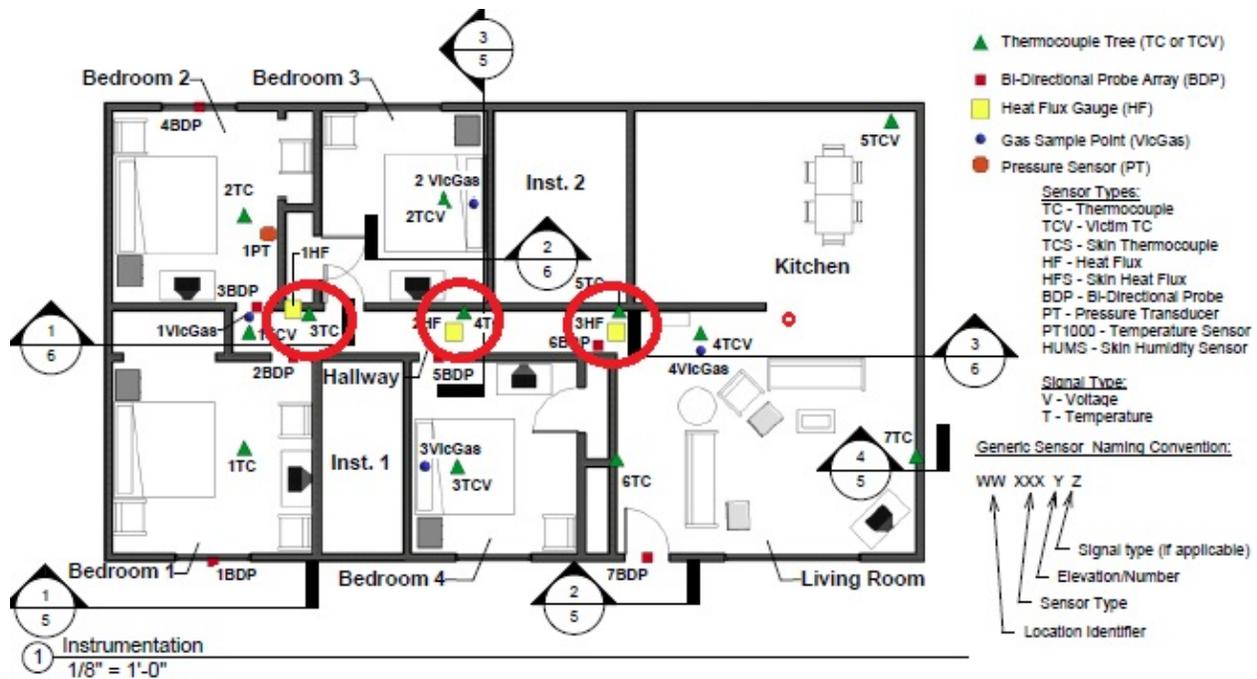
Floor plan with instrument locations for the UL FSRI fire attack study. The red circles indicate the measurement locations cited in Table 2.7. Moving from the front door toward the bedrooms, the locations are start, middle, and end of hallway, respectively. Fires were located in Bedroom 1 or Bedroom 1 and 2. [39].
